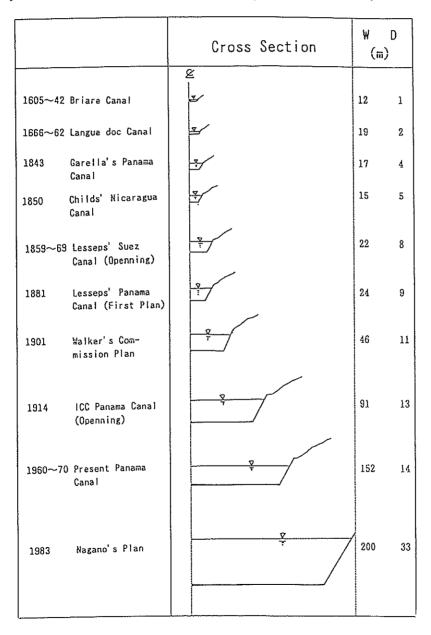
Trend of Cross Section of Waterway relating Major Canal Plans
